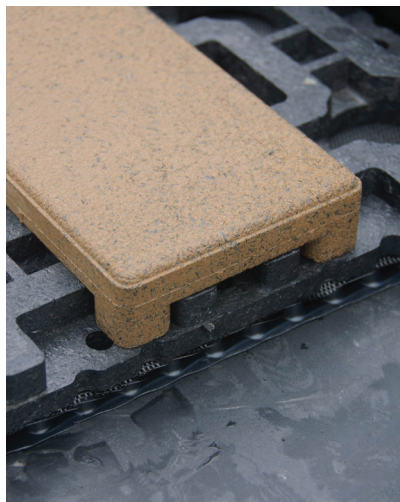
Drainage mat must be used when the grids and pavers are installed directly over a roofing surface.
